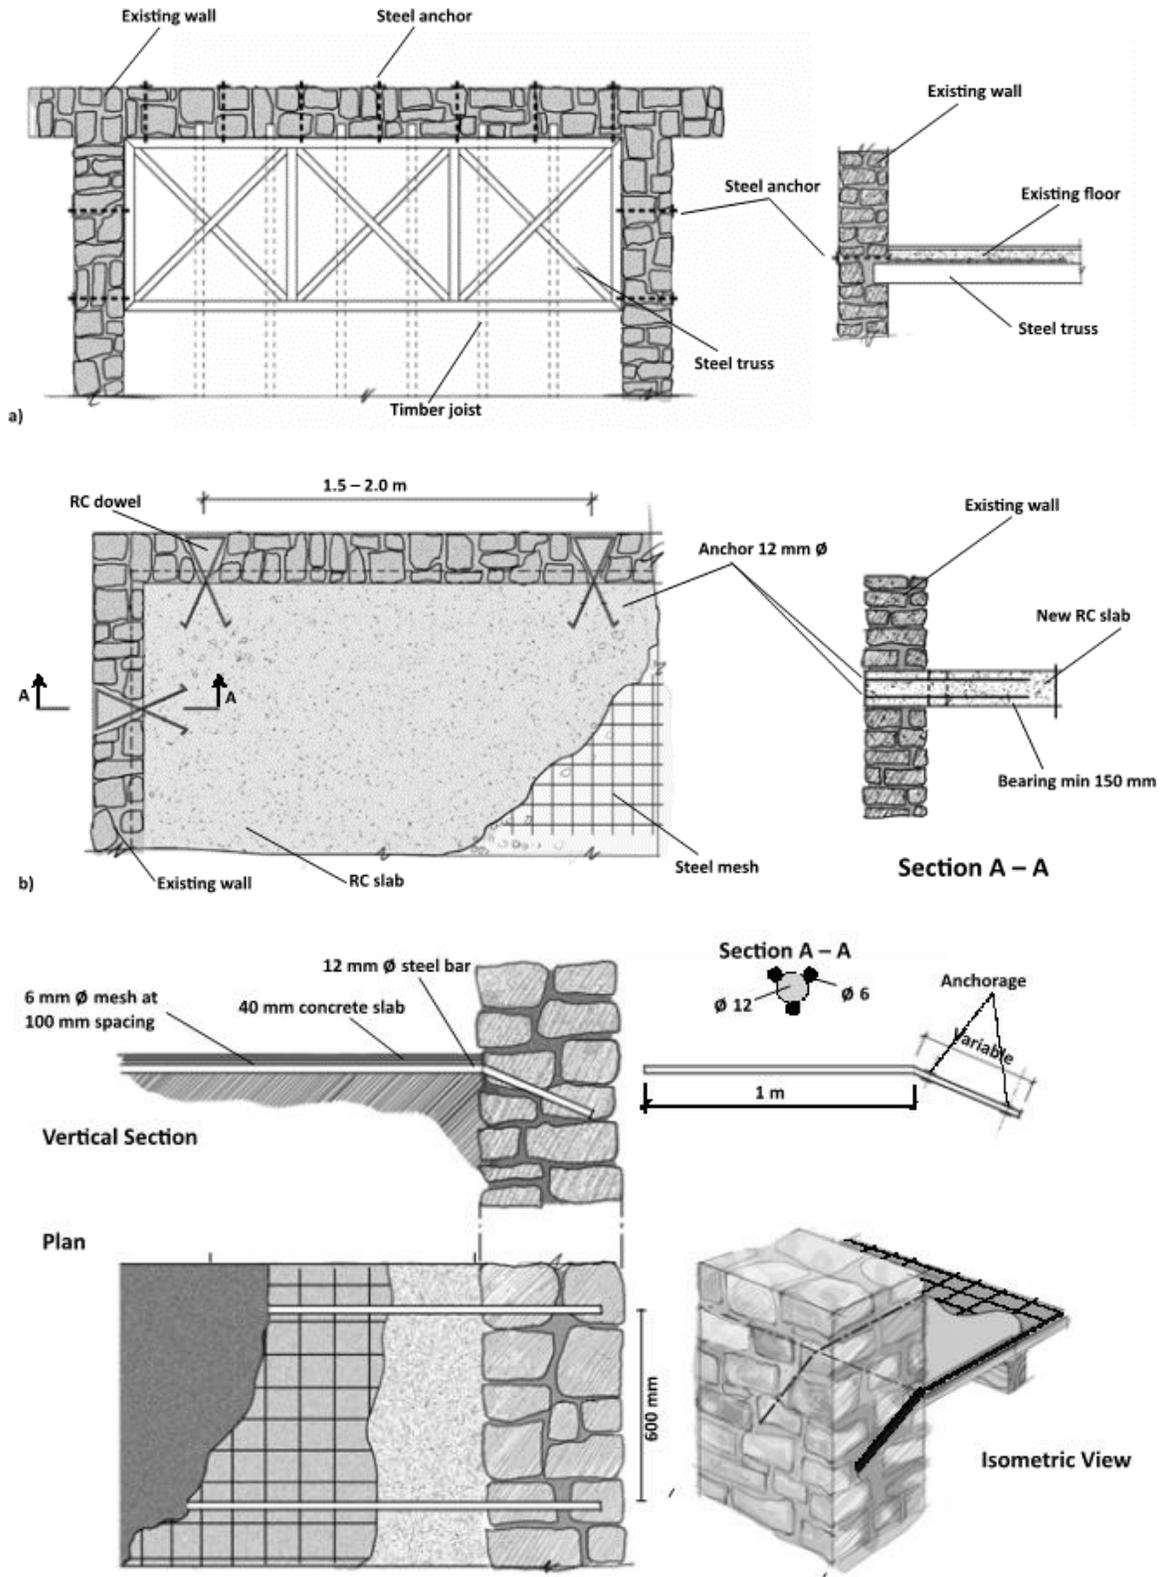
Retrofitting the wall ensuring adequate connections to existing walls: a) diagonal braces, b) new RC slab (Bothara & Brzev, 2011)
